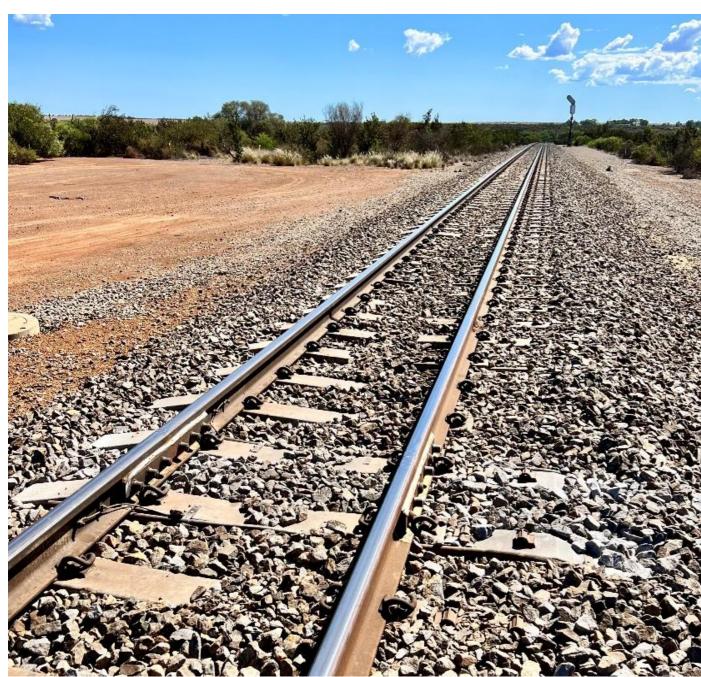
Gauge Upgradable Concrete Sleepers (Geraldton-Mullewa Railway)
